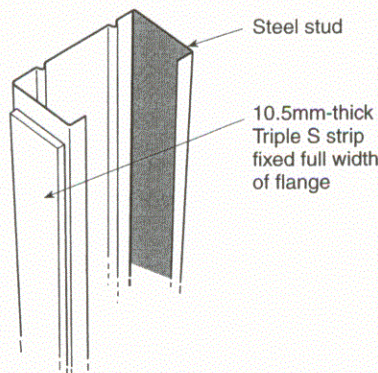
THERMAL BRIDGING TO STEEL STUDS
